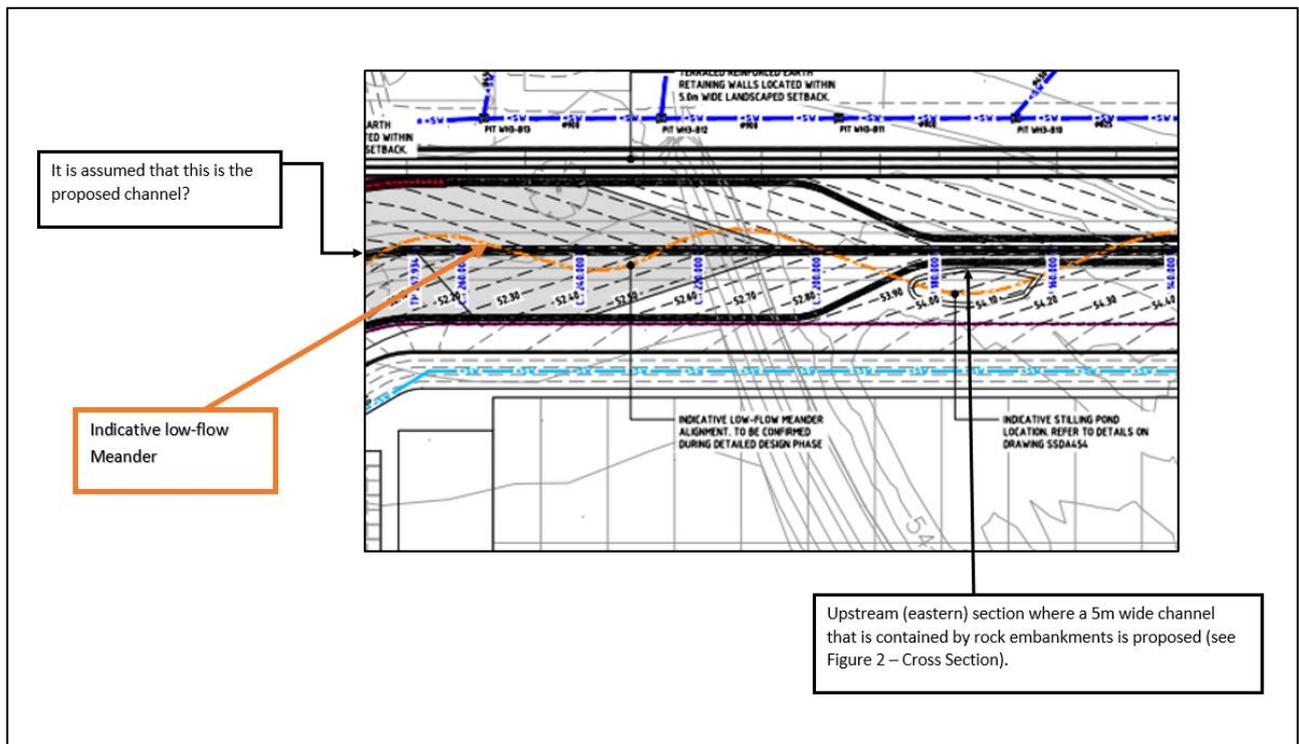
From Drawing C013874.06-SSDA420 (E2 Corridor General Arrangement Plan) from Appendix K – Civil Drawings
